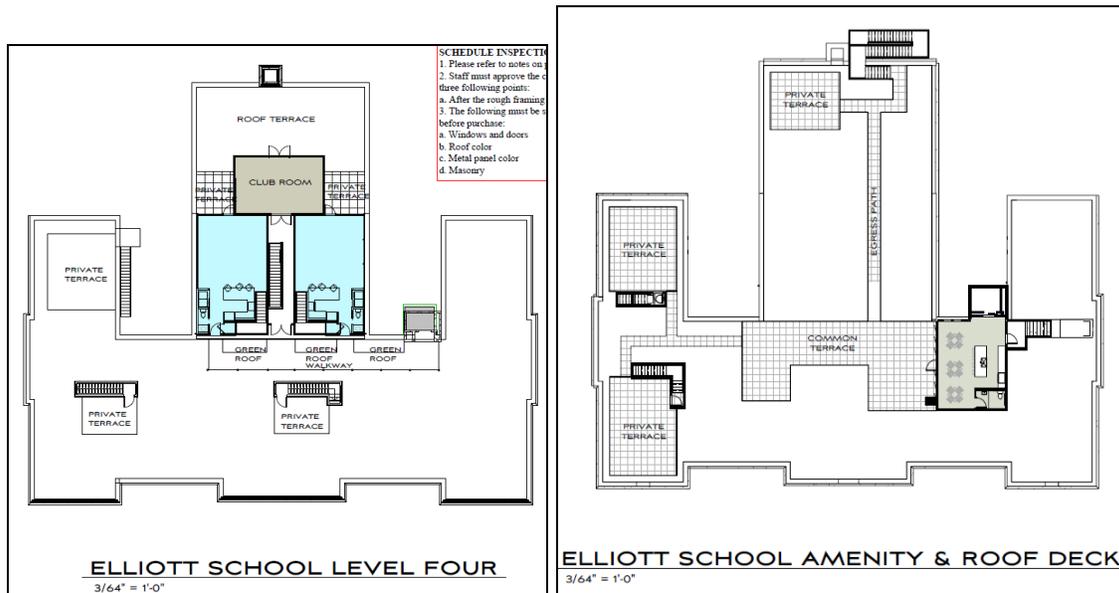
(left) is the roof plan approved in 2016 and Figure 5 (right) is the proposed roof plan.
